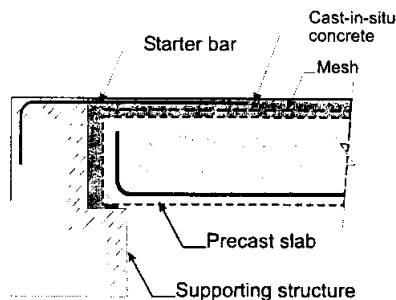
A typical support detail for precast concrete slabs with ends cast into surrounding construction [13].
